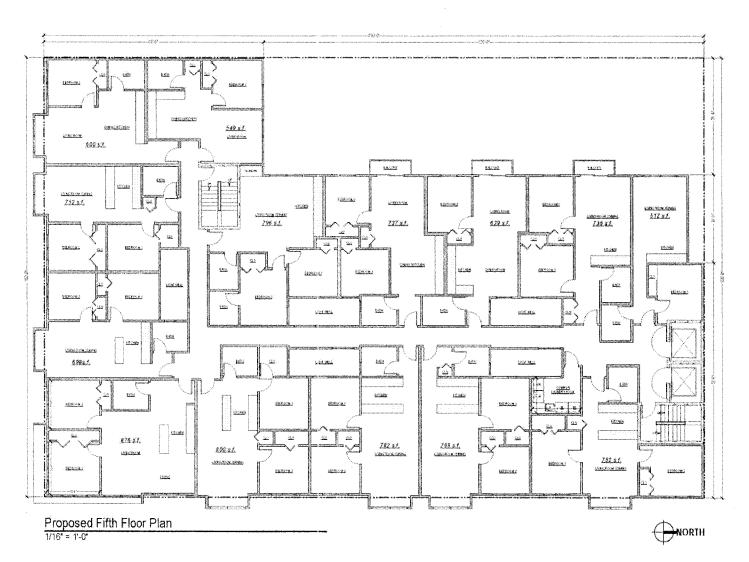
Fifth Floor Plan 480 Potrero Avenue Source: Sia Consulting, August 2012
